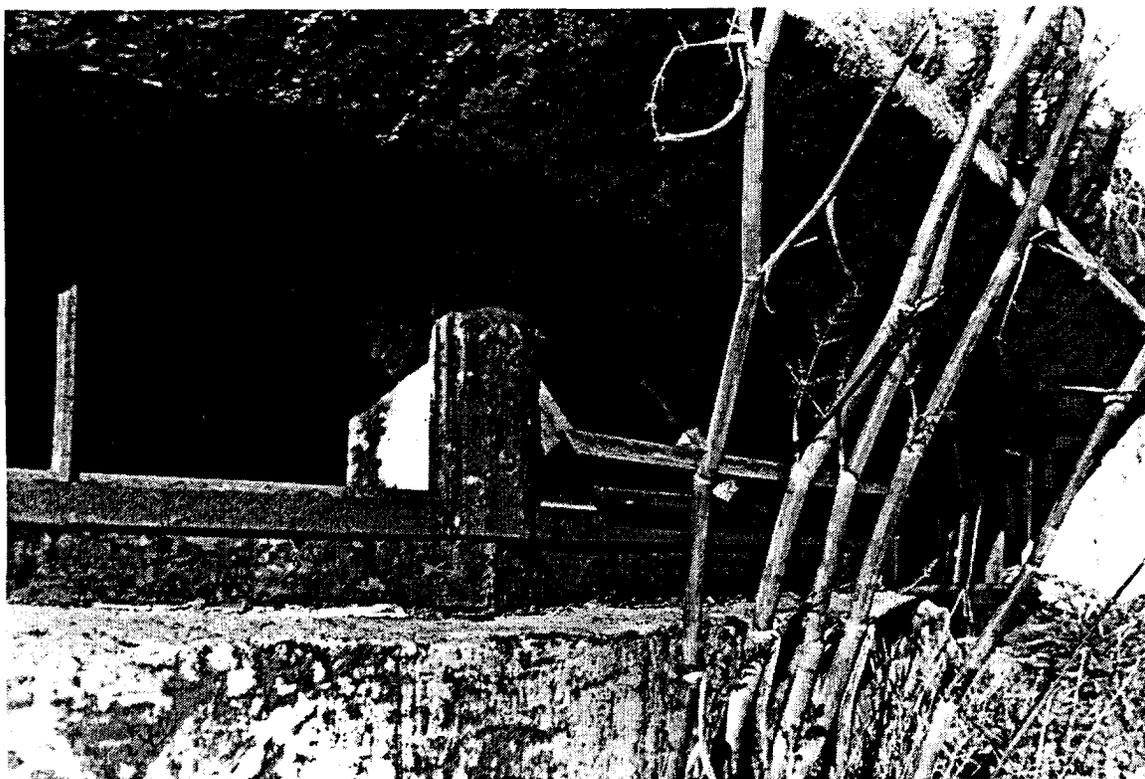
The simple contrasting color scheme of black and white was basic to early concrete fortifications. This interior view of Marcus Miller also shows the round-arched ceilings that were also typical of the first construction work of the 1890s.
